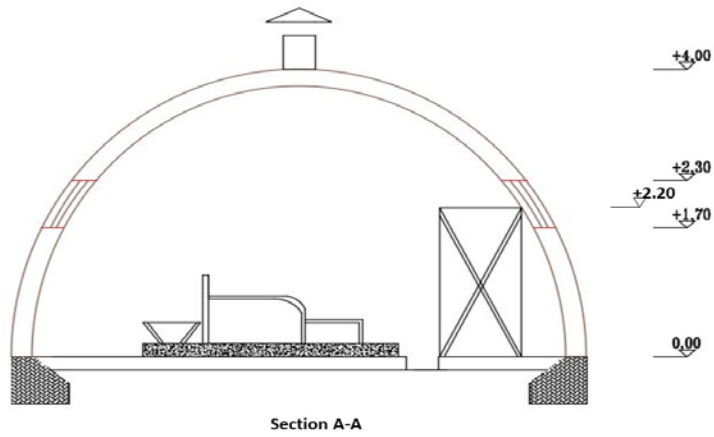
the sectional view of 20-headed prefabricated barn with lightweight concrete
